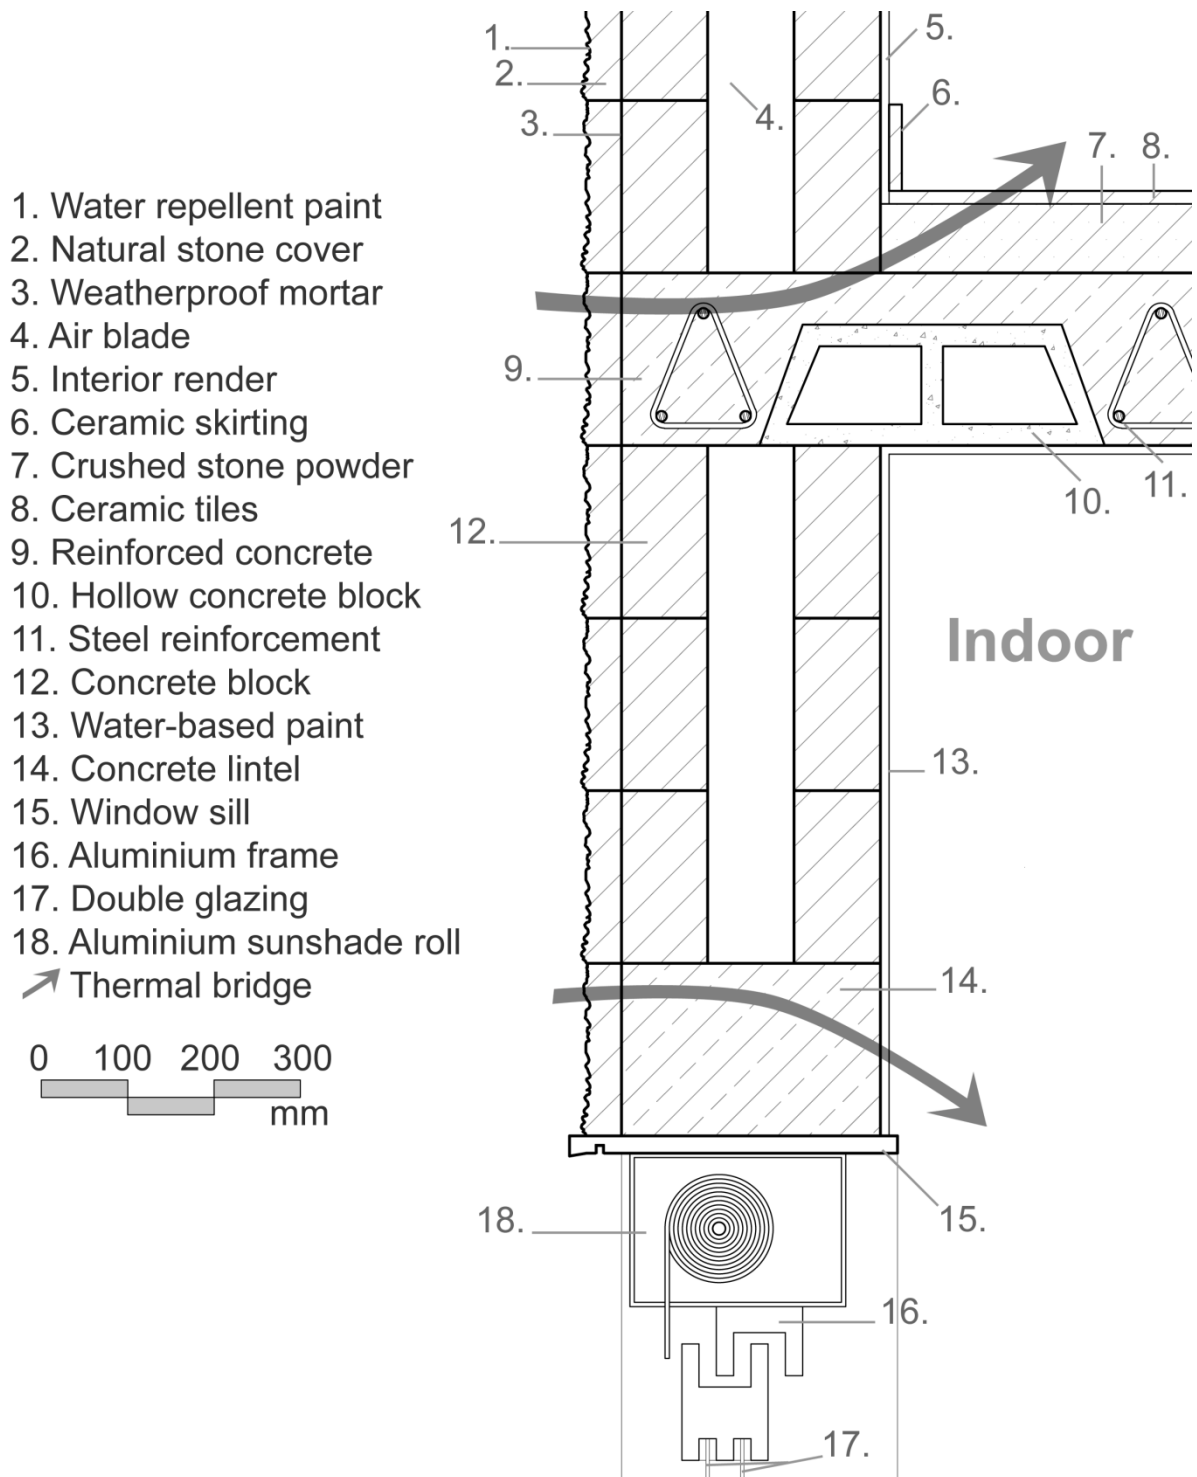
Wall-slab junction detail of the case study apartment building in Sehaileh, Lebanon
